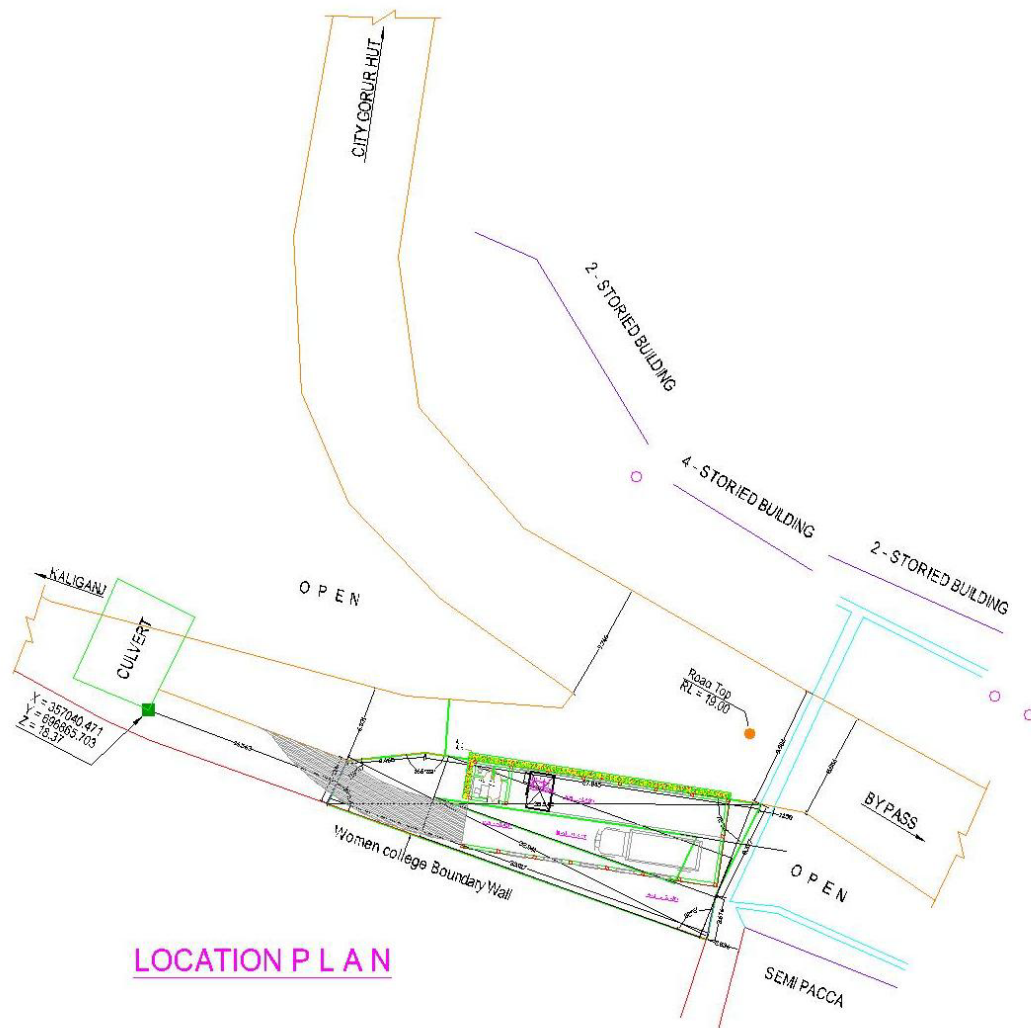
STS – 1 Court Station Walton Showroom Preliminary Plan
